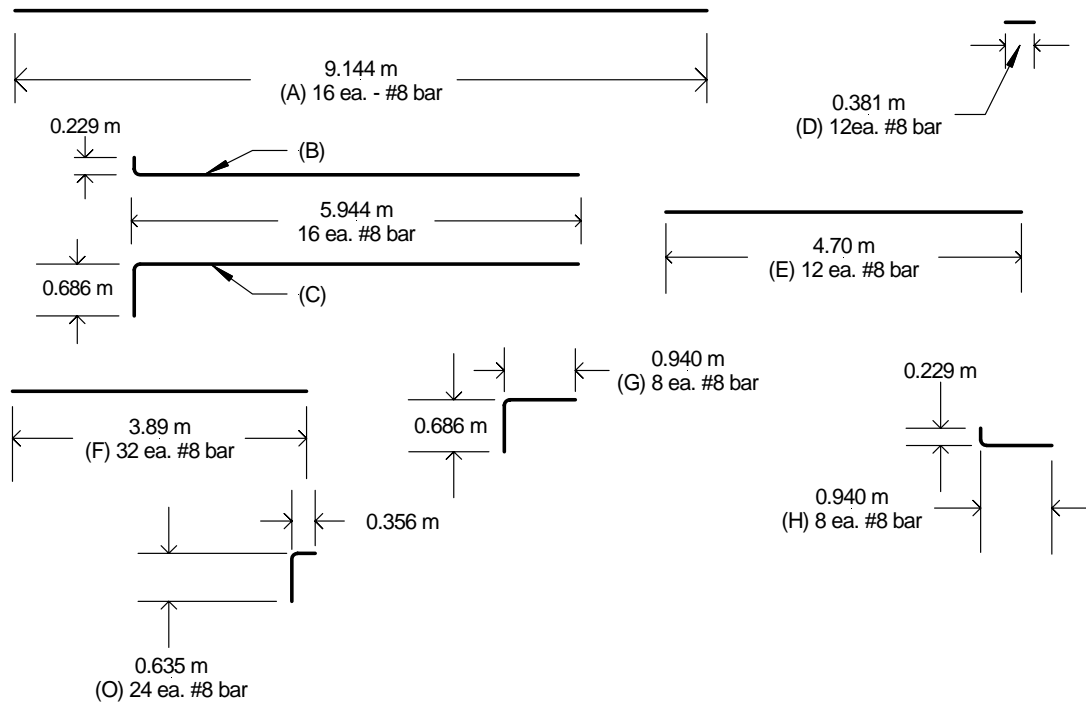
Longitudinal steel used in the retrofitted grade beam
